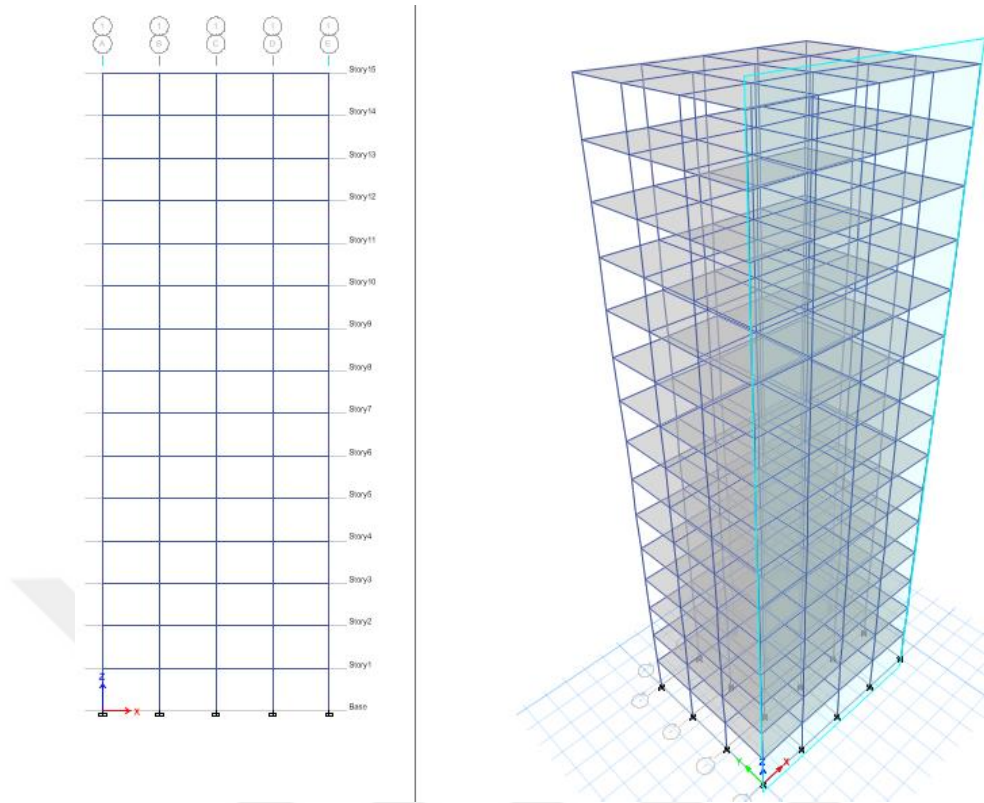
The 15-story building with moment-resisting frame and without shear walls.
